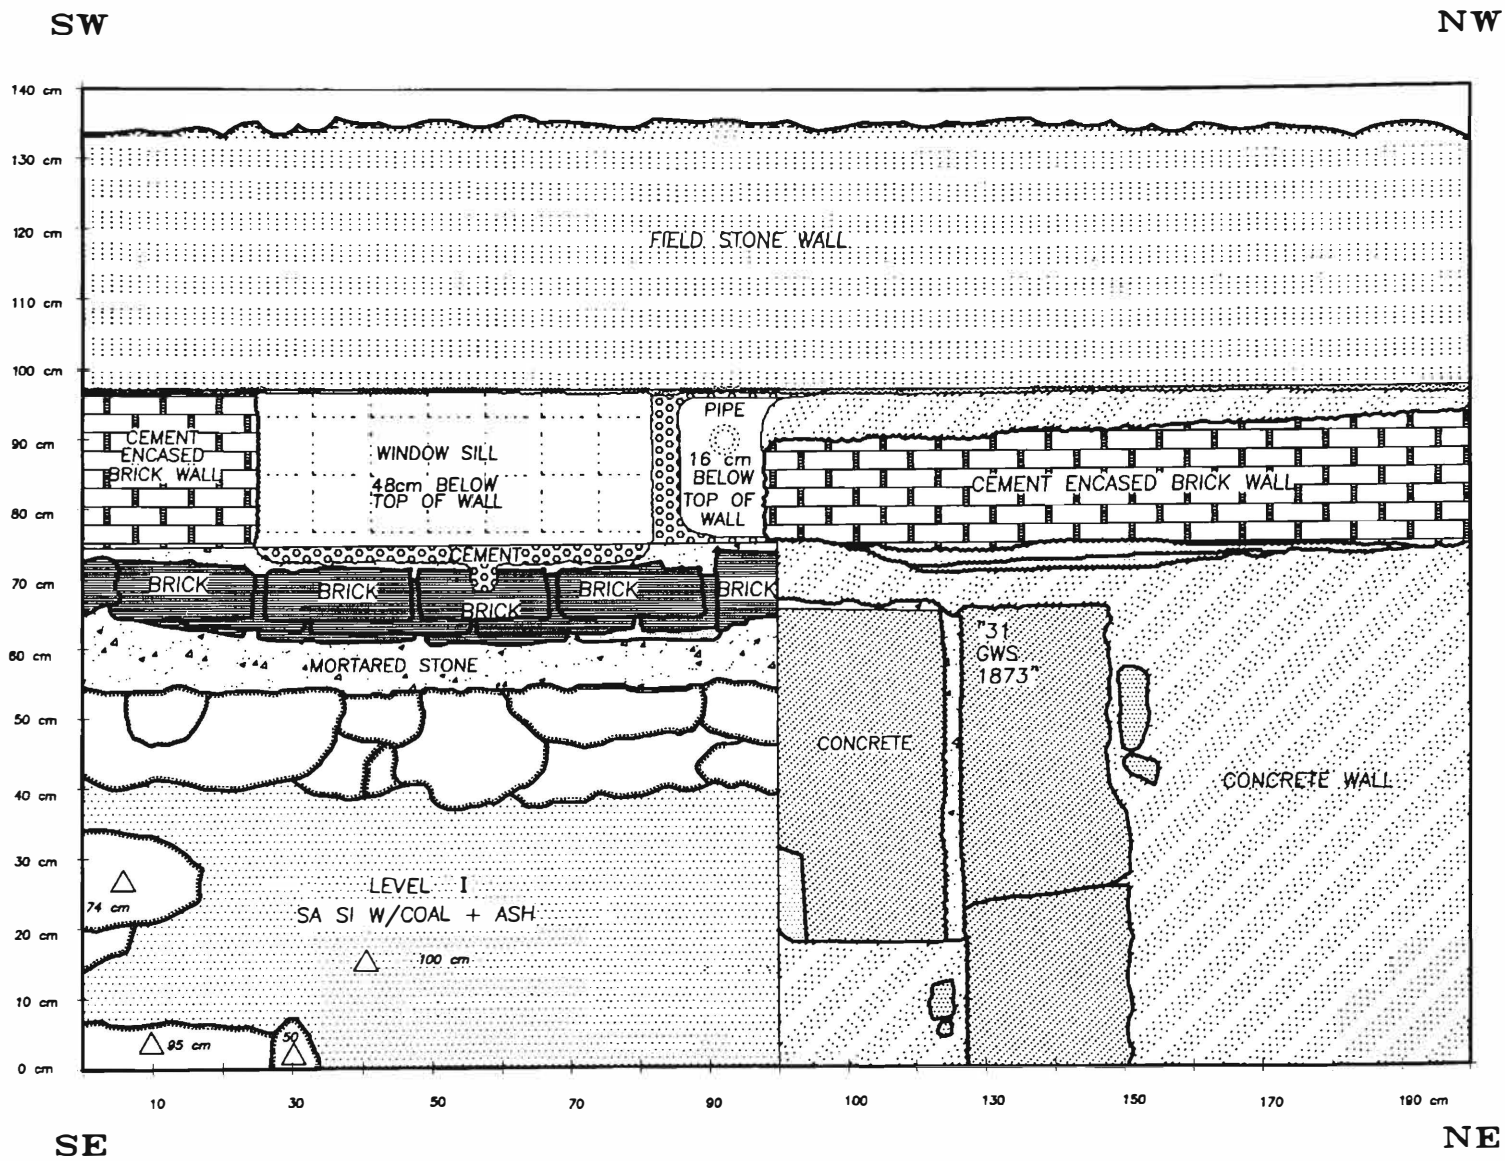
Plan view of the east wall of Features 3 and 4 in Unit 7 and the inscribed concrete pad on the north side.
